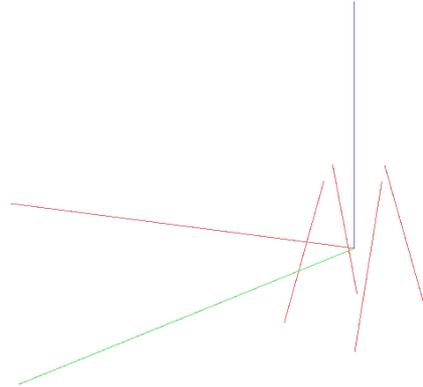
Refined Strut and Tie Layout for Four Piles Pile Cap (Span/Depth=1)
